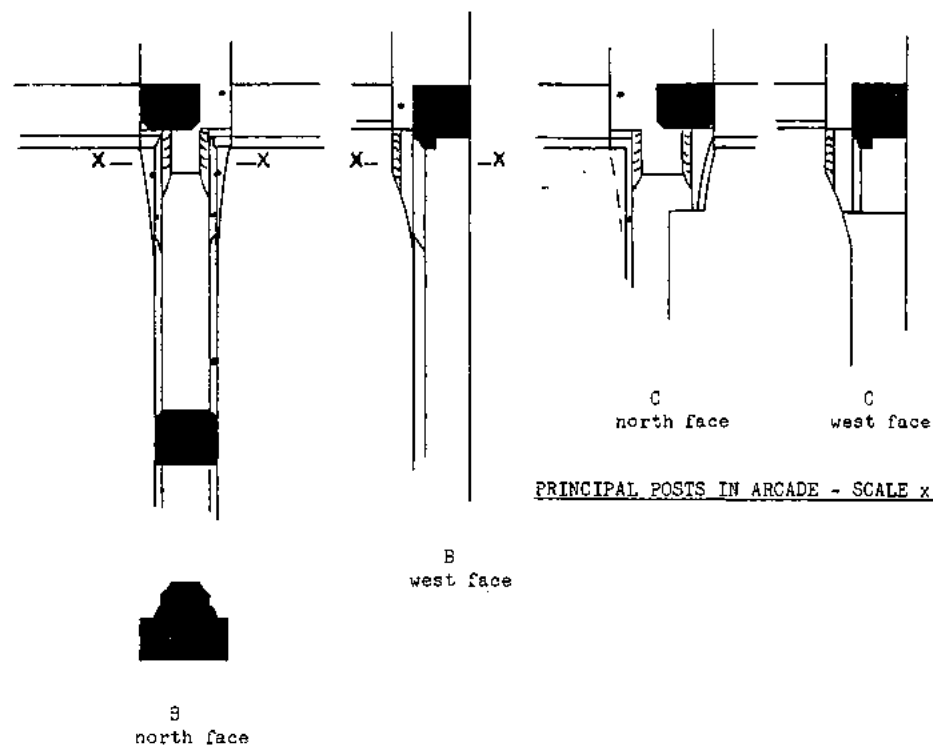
Other details of ground-floor arcade in the Lodging Range of Newland Hall, Roxwell.
